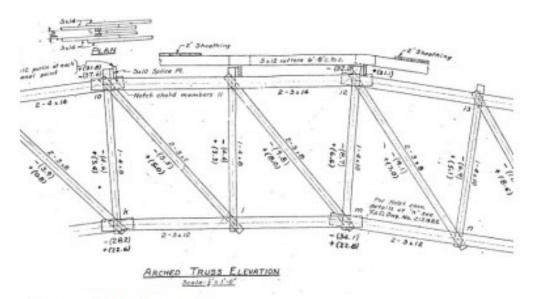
Detail of truss construction. Source: Navy Department, Bureau Yards & Docks, Lighter-Than-Air Hangar Roof Truss Details, Drawing #212817, (August 5, 1942).
